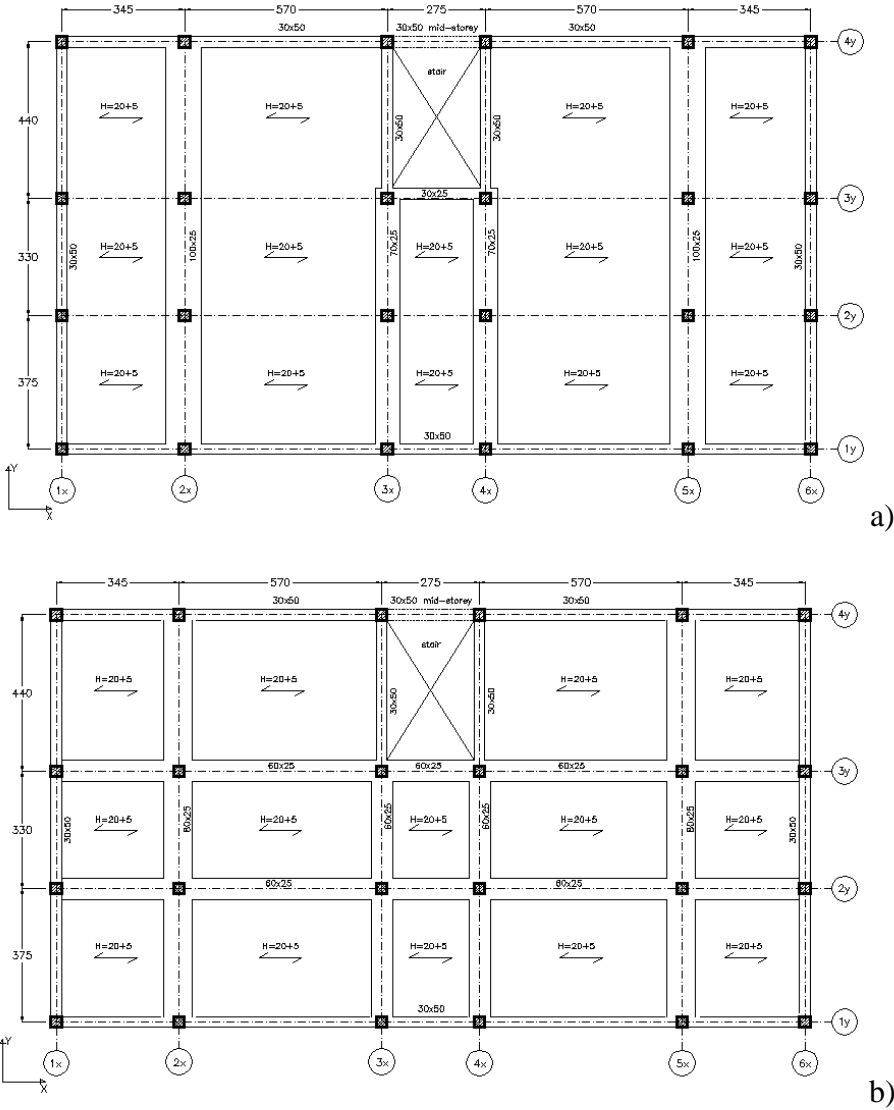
Floor plan for GLD (a) and SLD (b) types.
